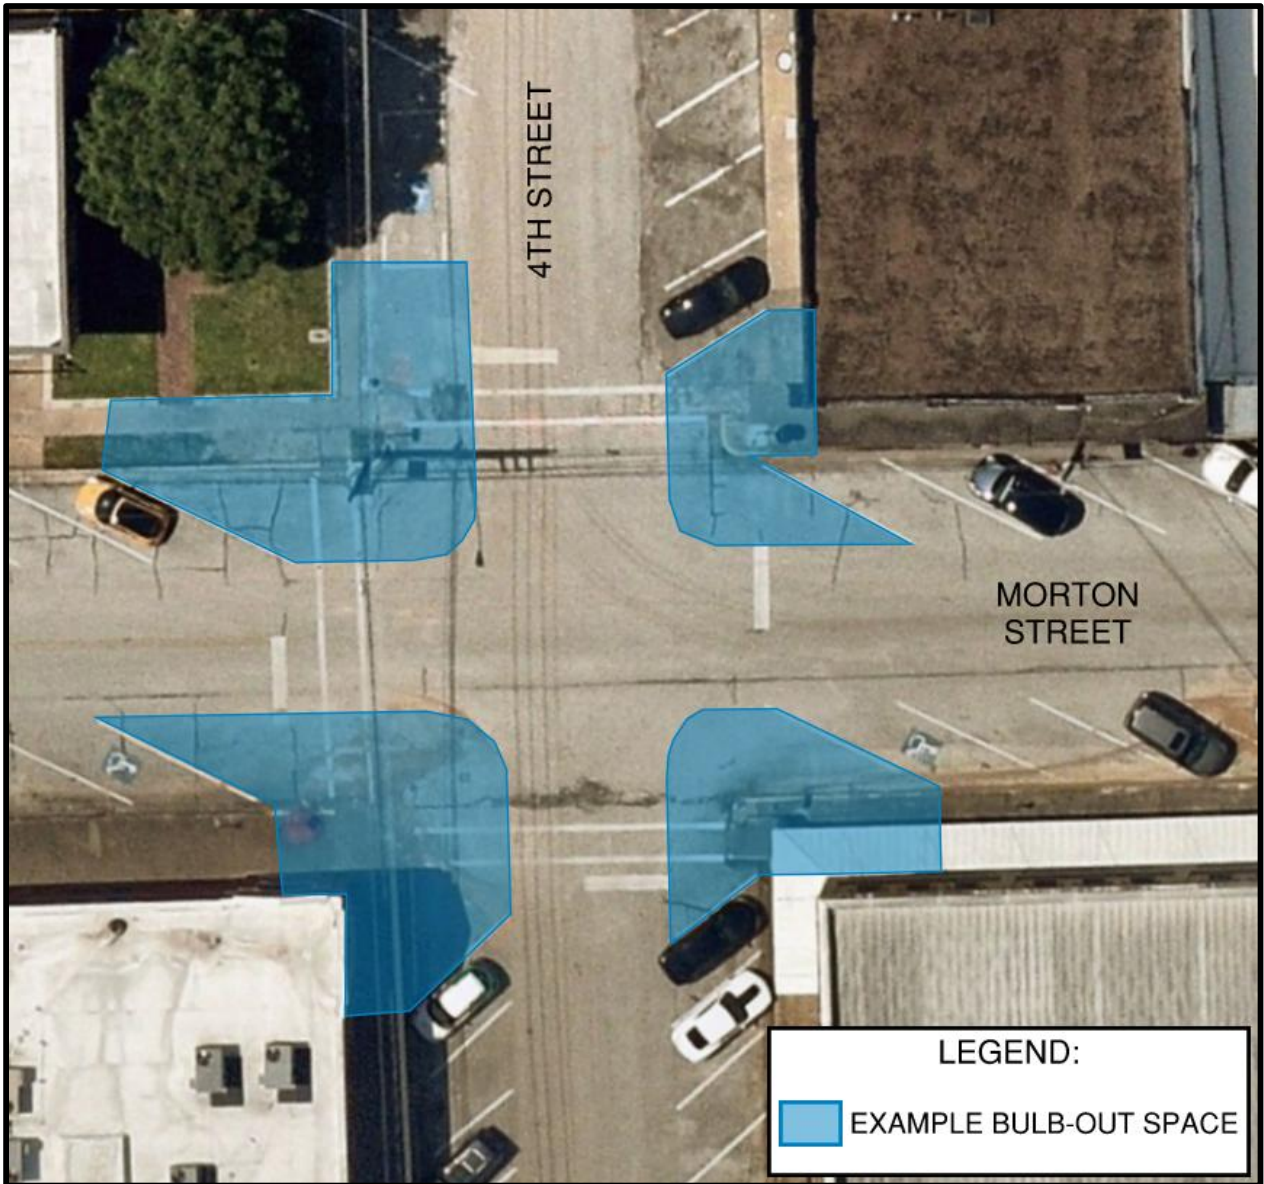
An Example of Bulb-Out Space at Morton Street and 4th Street
